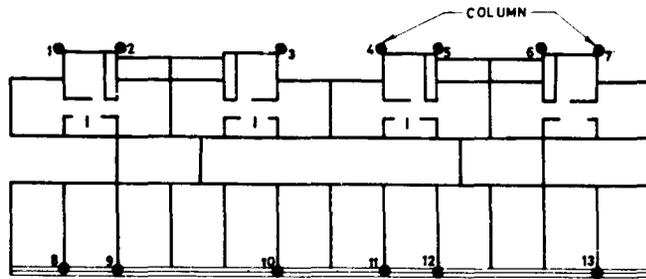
GROUND FLOOR PLAN BUILDING- G10
